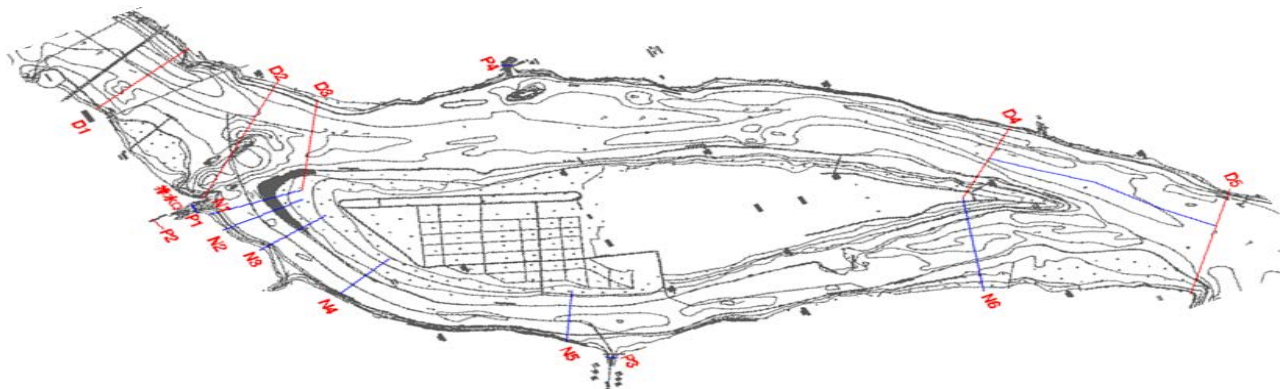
The plan about power plant layout and measurement section of downstream river basin
